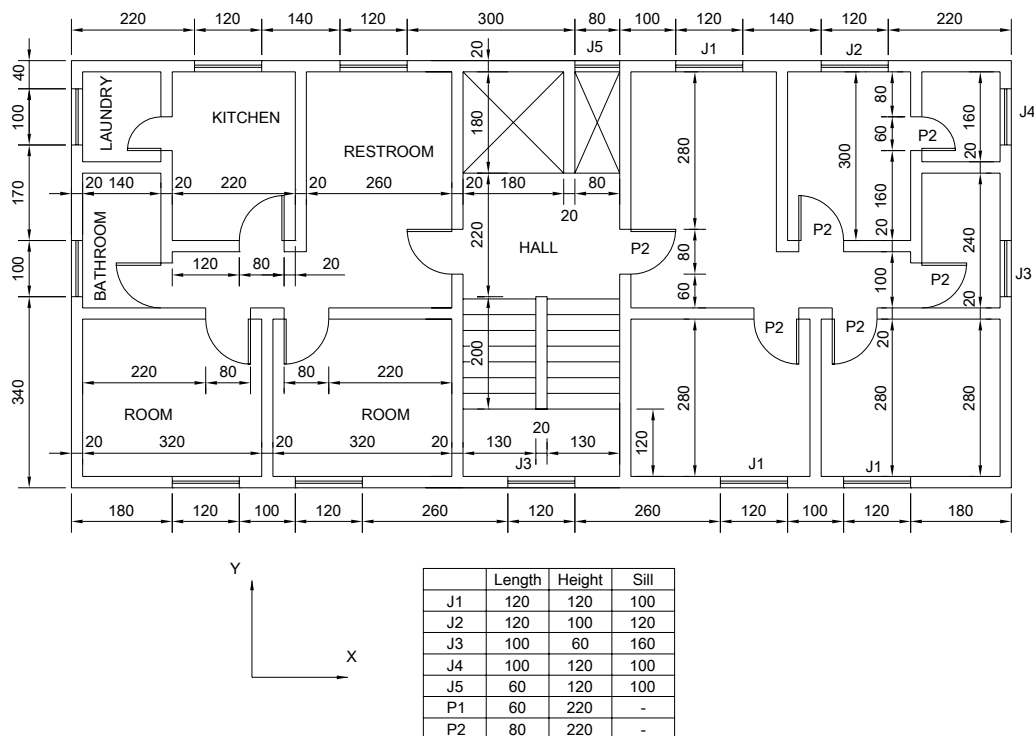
Plan view of typical floor of the building (Ramalho and Côrrea, 2003 - dimensions in cm)
